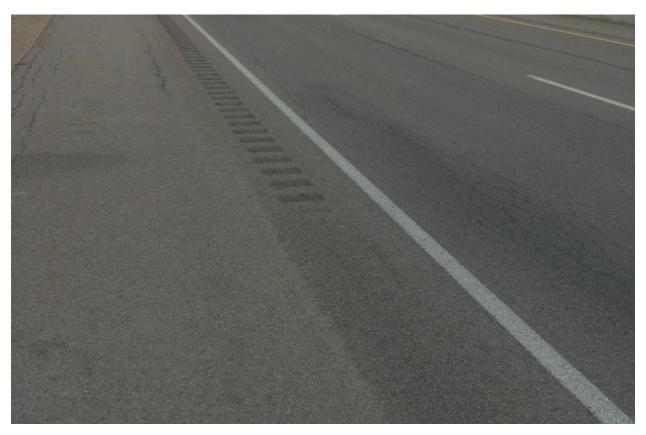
Rutting and fatigue cracking on I-80
